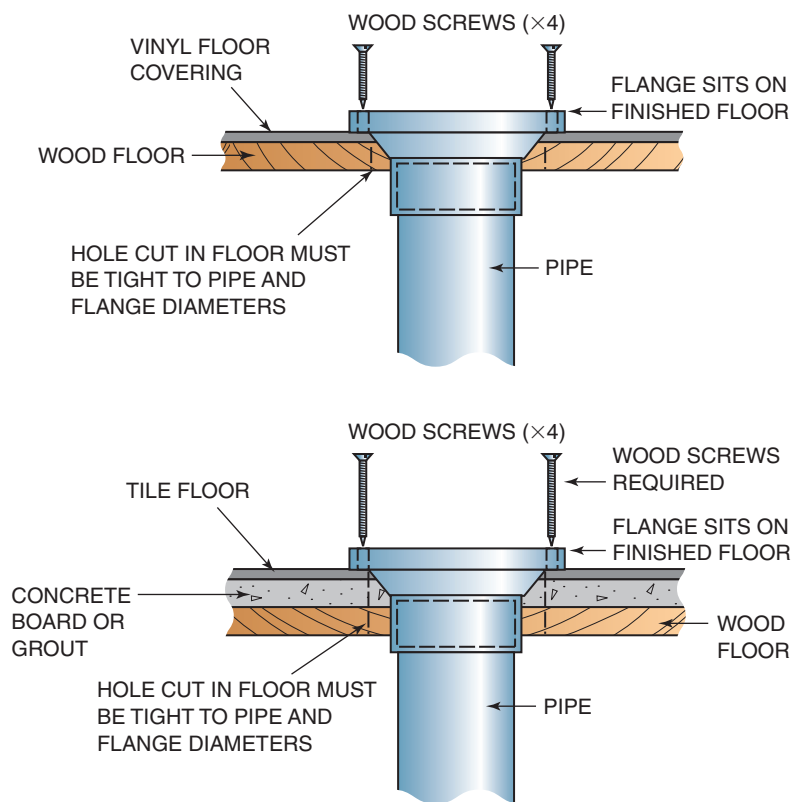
A closet flange is secured to the wooden floor to eliminate movement when the toilet is installed.
